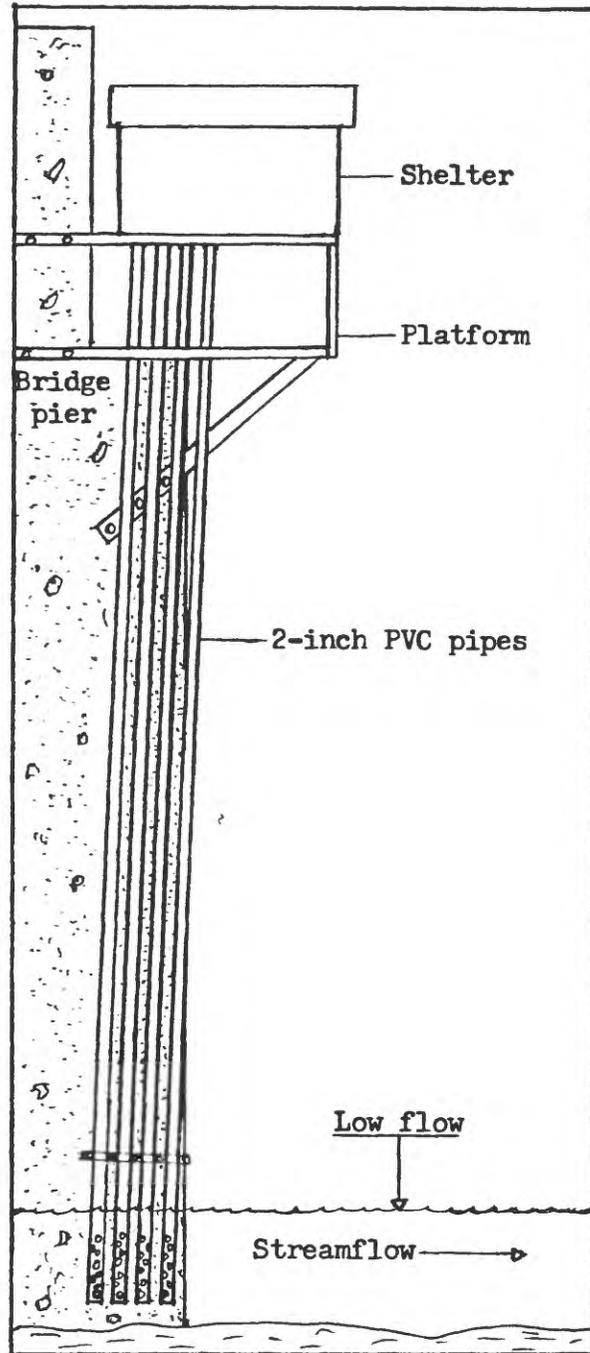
Bridge-pier installation of shelter and separate housings for each mini-monitor sensor.
